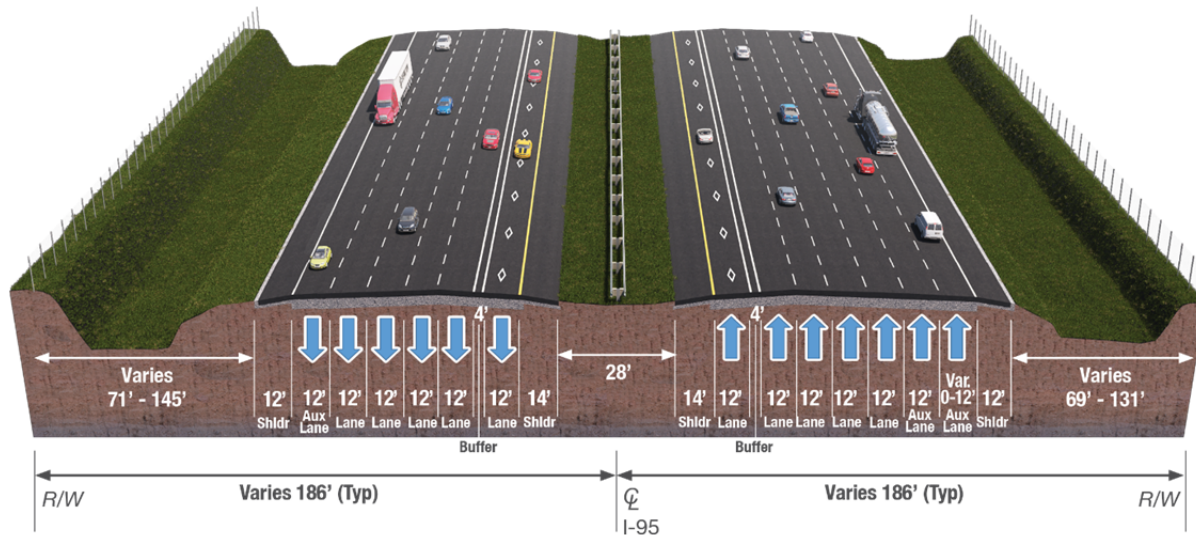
Typical Section – I-95 South of Central Boulevard (Mainline Alternative 2)
